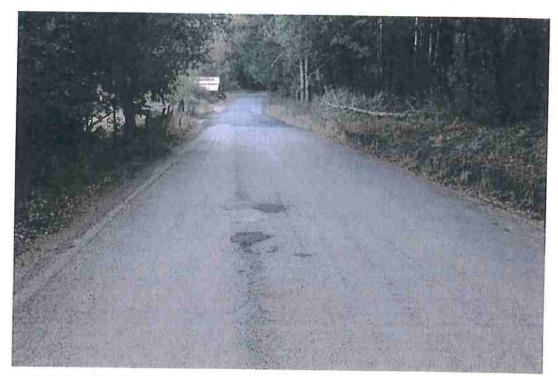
Mile 0.7: 20-ft road width with 2-ft shoulders.
